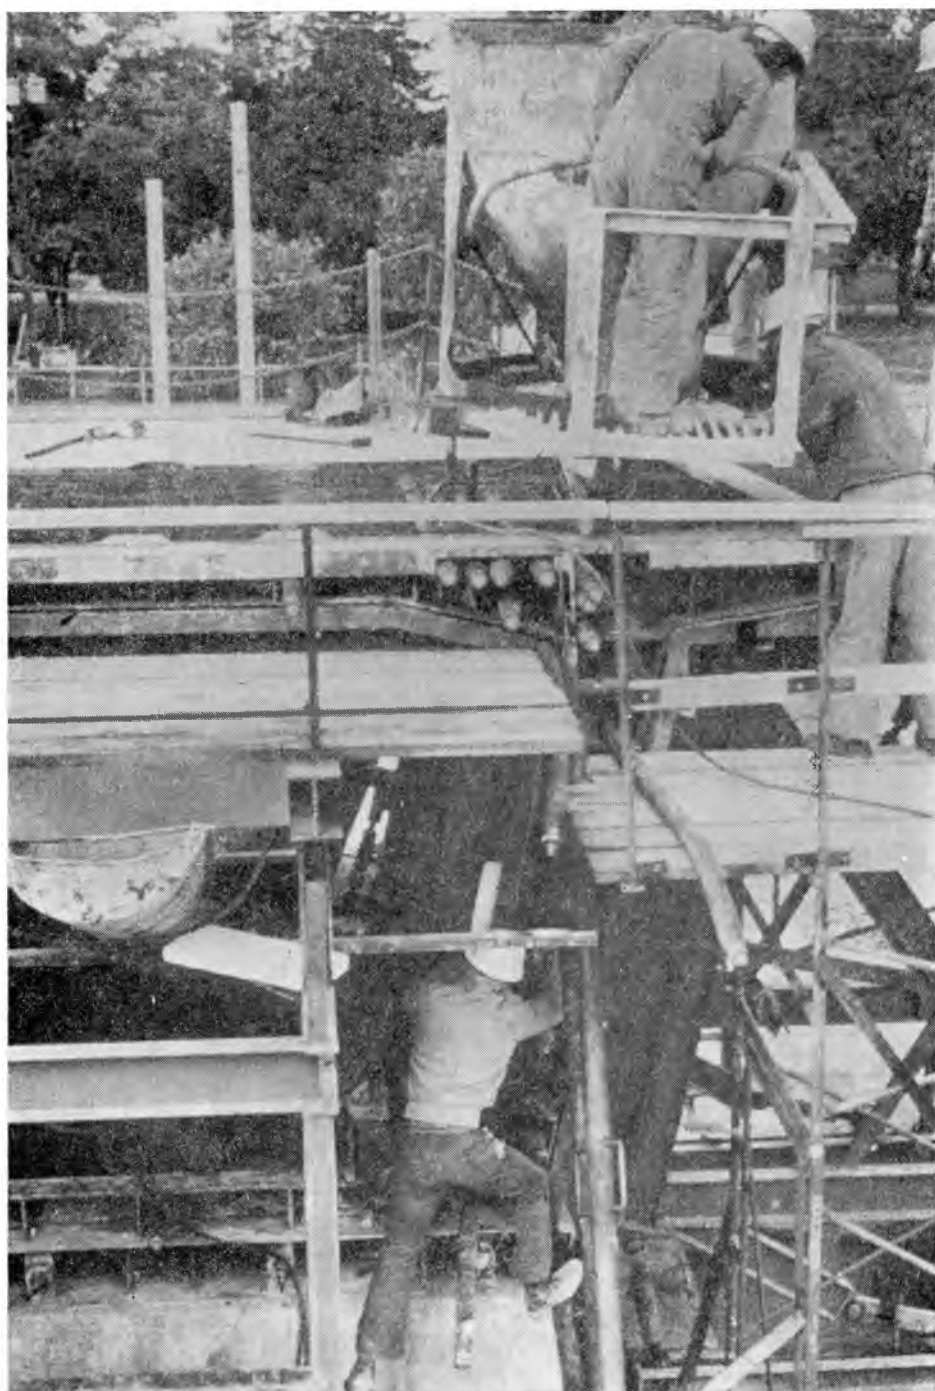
Reinforcing bars being placed for construction of one of the bridge segments. Note the ducts that will carry post-tensioning tendons.
